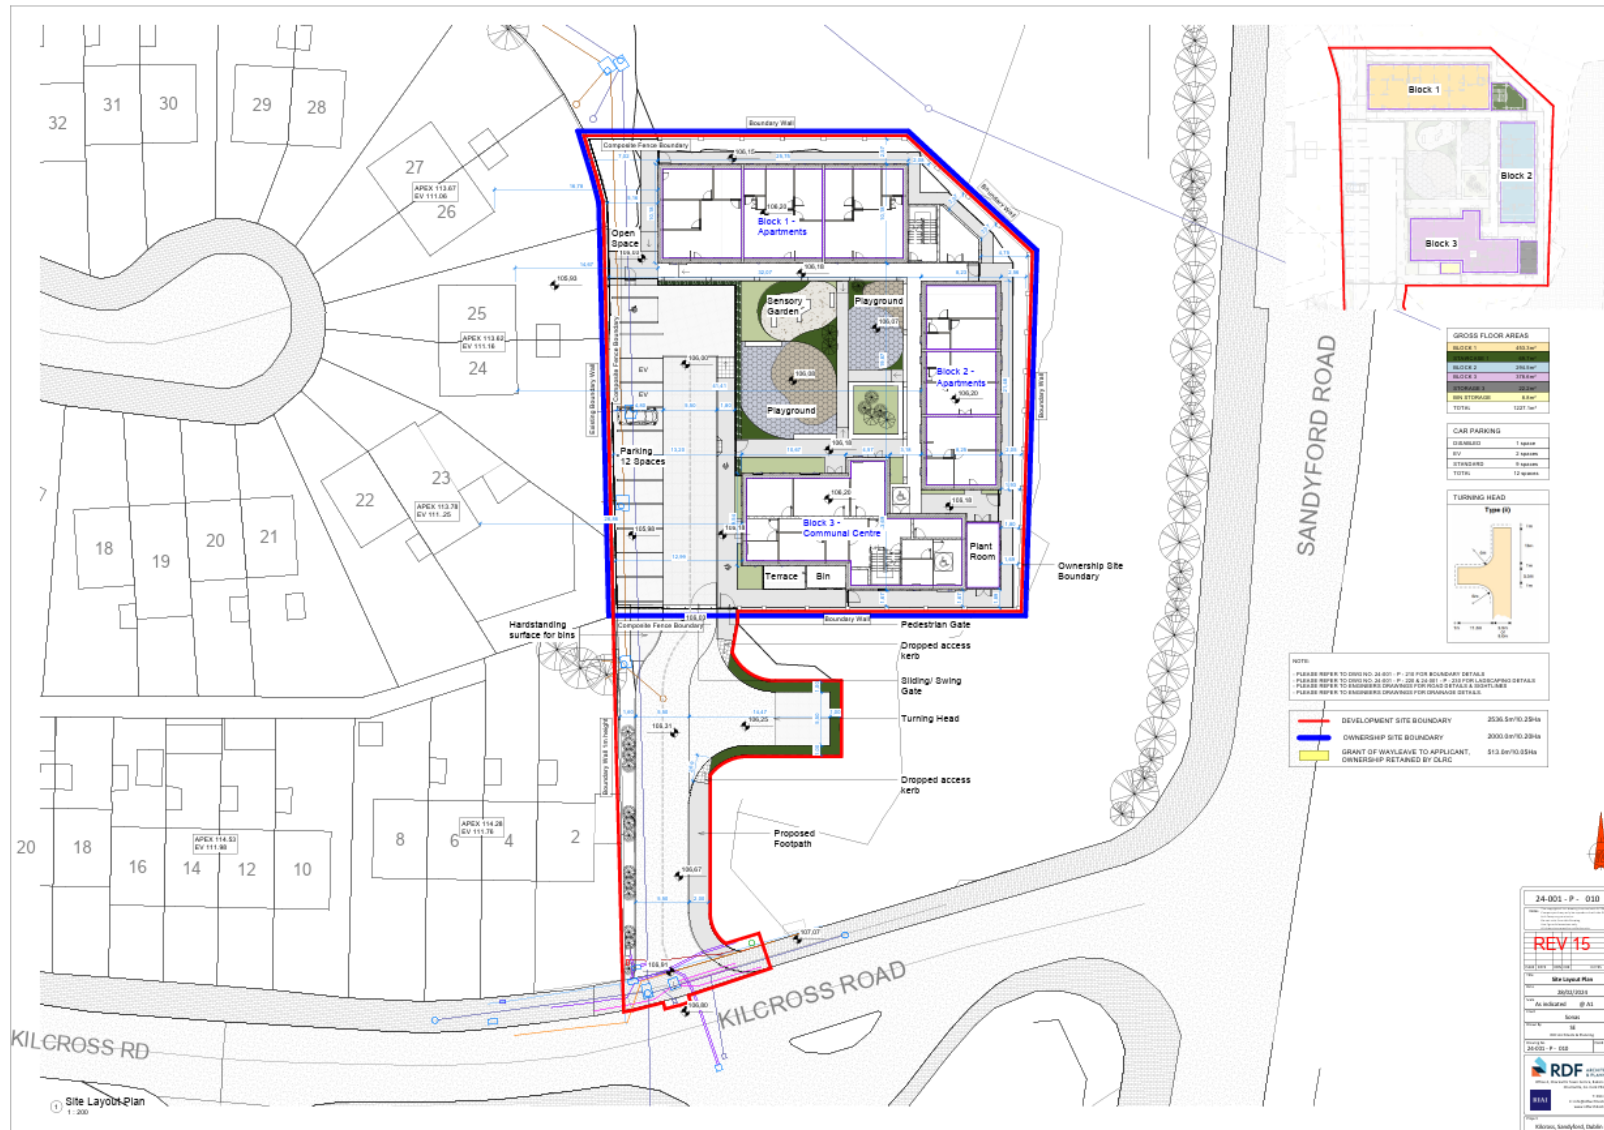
Site Layout Plan (RDF Architects, 2024)
